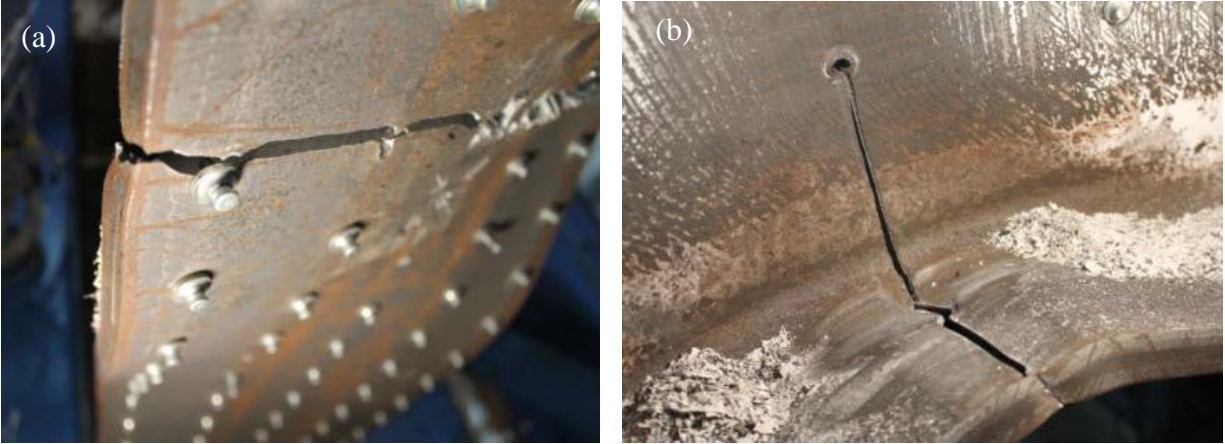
Fracture Through the Bottom Flange as Shown From the (a) Bottom Side View and (b) Side View Showing Fracture Extension to Web PAF Hole for Specimen 12 (W36x150 with no RBS and Grid of PAF)
